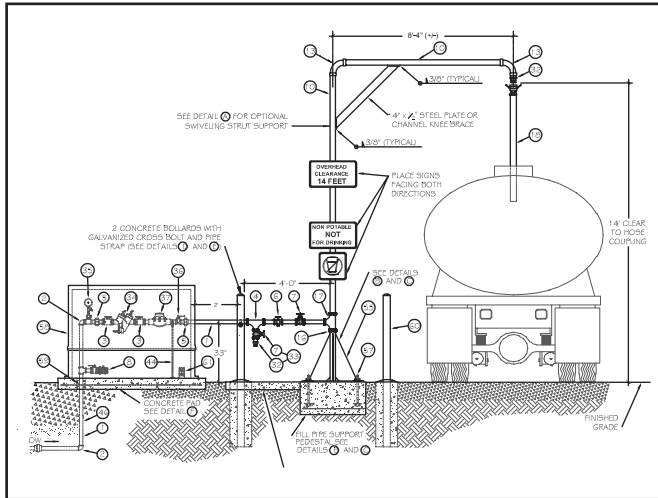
Part of the elevation view of the pressure-type fill station with a steel tower from the water tanker fill station plans.
